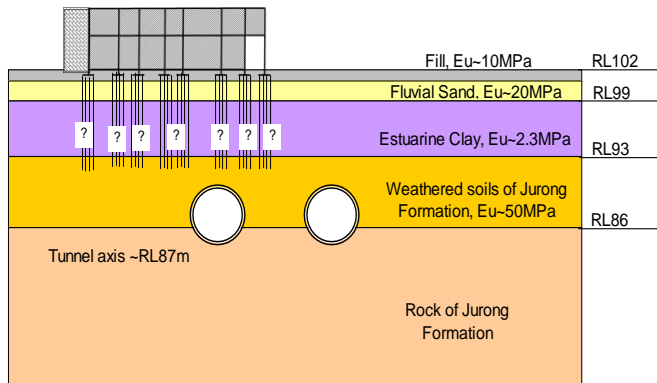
Typical soil section at Pasir Panjang shophouse A29 (western end)
